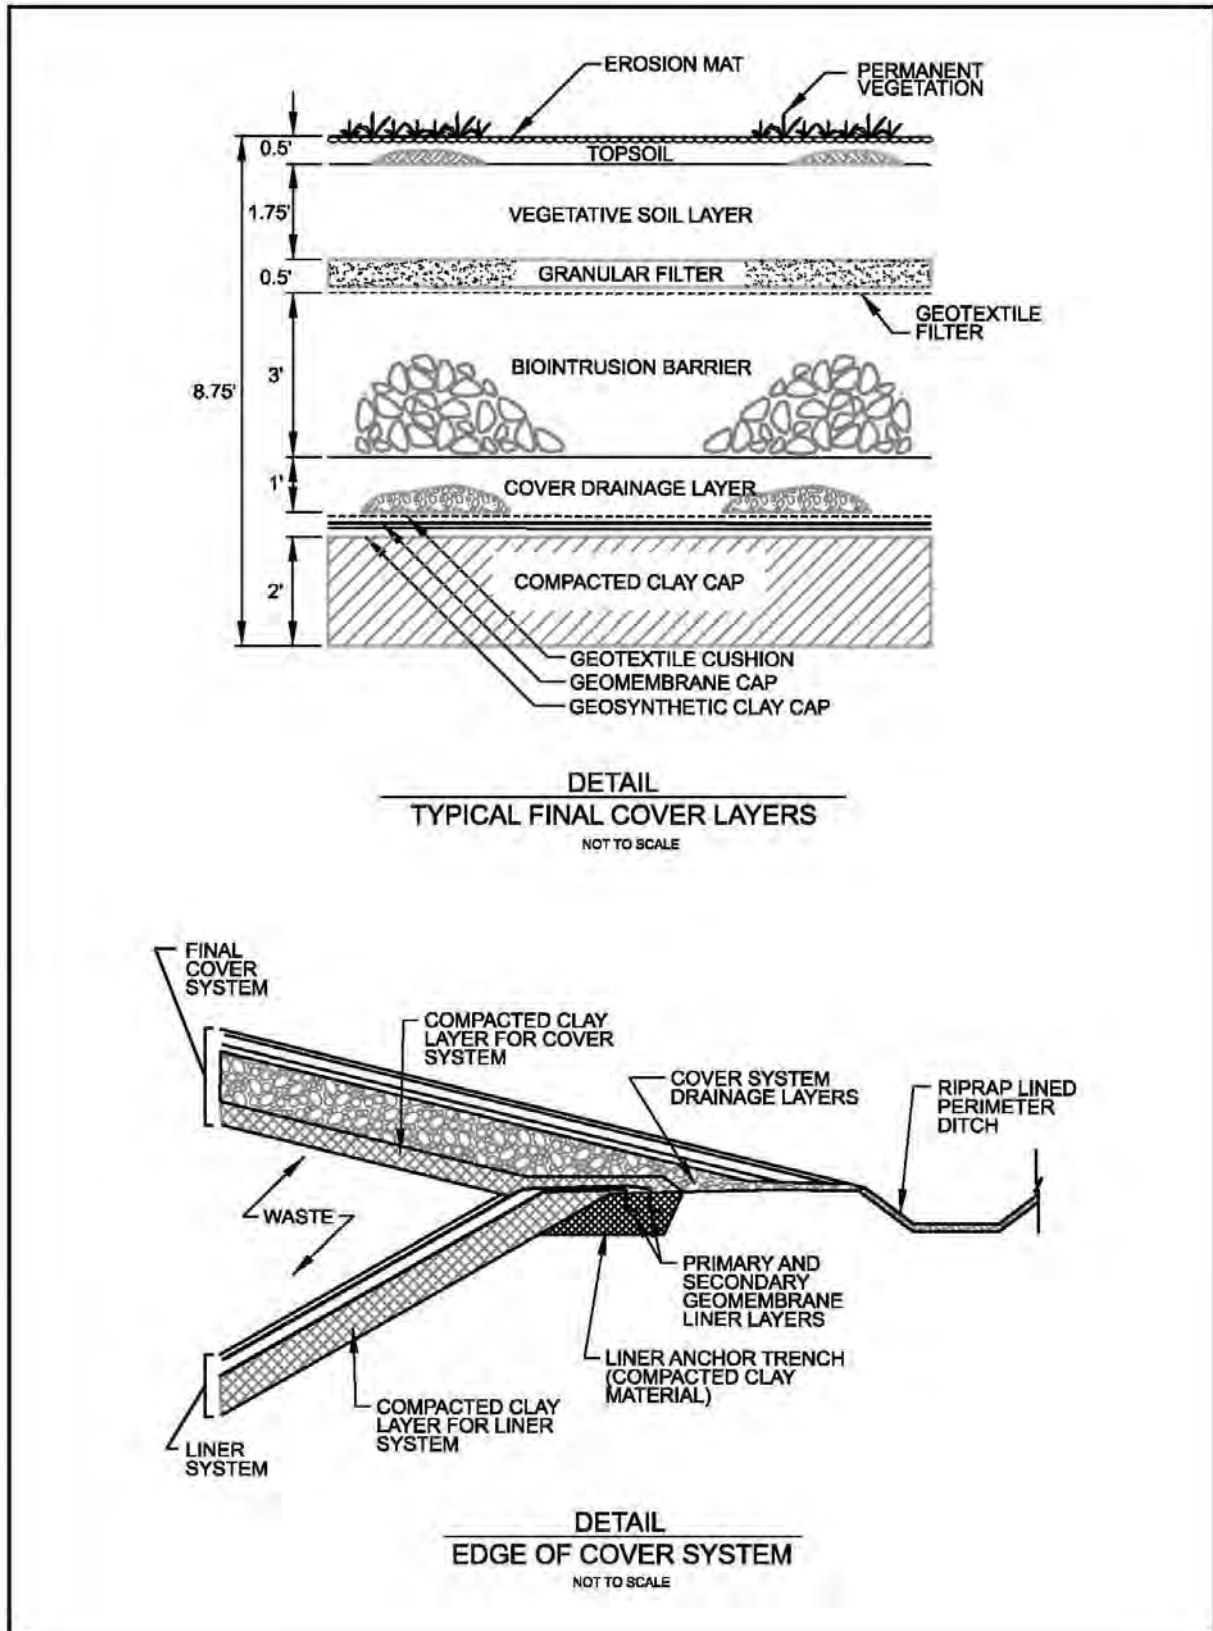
Typical Section View – Landfill Final Cover System for Alternative 2
